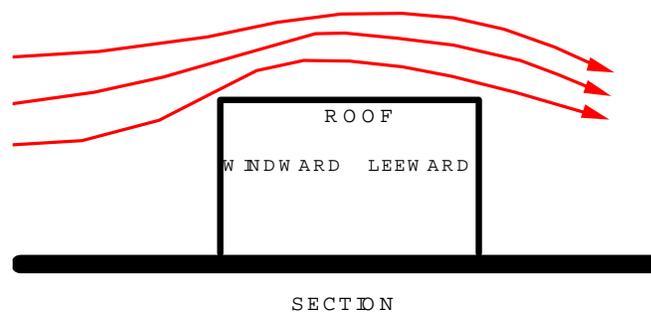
Wind Flow Over Simple Building with Flat Roof
